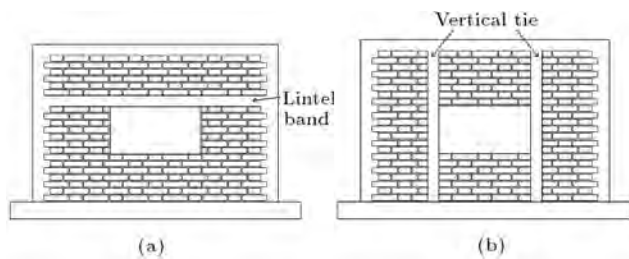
CM walls with additional ties. (a) CM wall with lintel band; and (b) CM wall with two added vertical ties on sides of opening.
